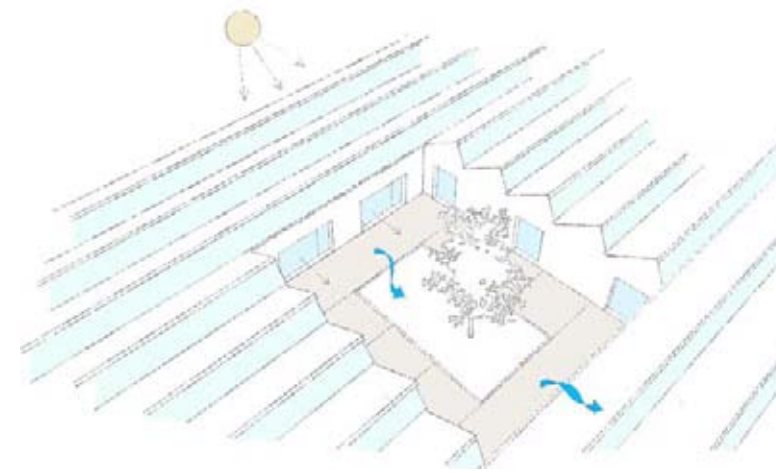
Courtyard providing sunlight, ventilation and external views to inner rooms. This diagram shows the roof removed in its entirety to the open area. The roof structural framework could be retained. This approach would mean that more historic fabric could be retained and could also offer an added structural integrity to the building and a stiffness to the roof.
